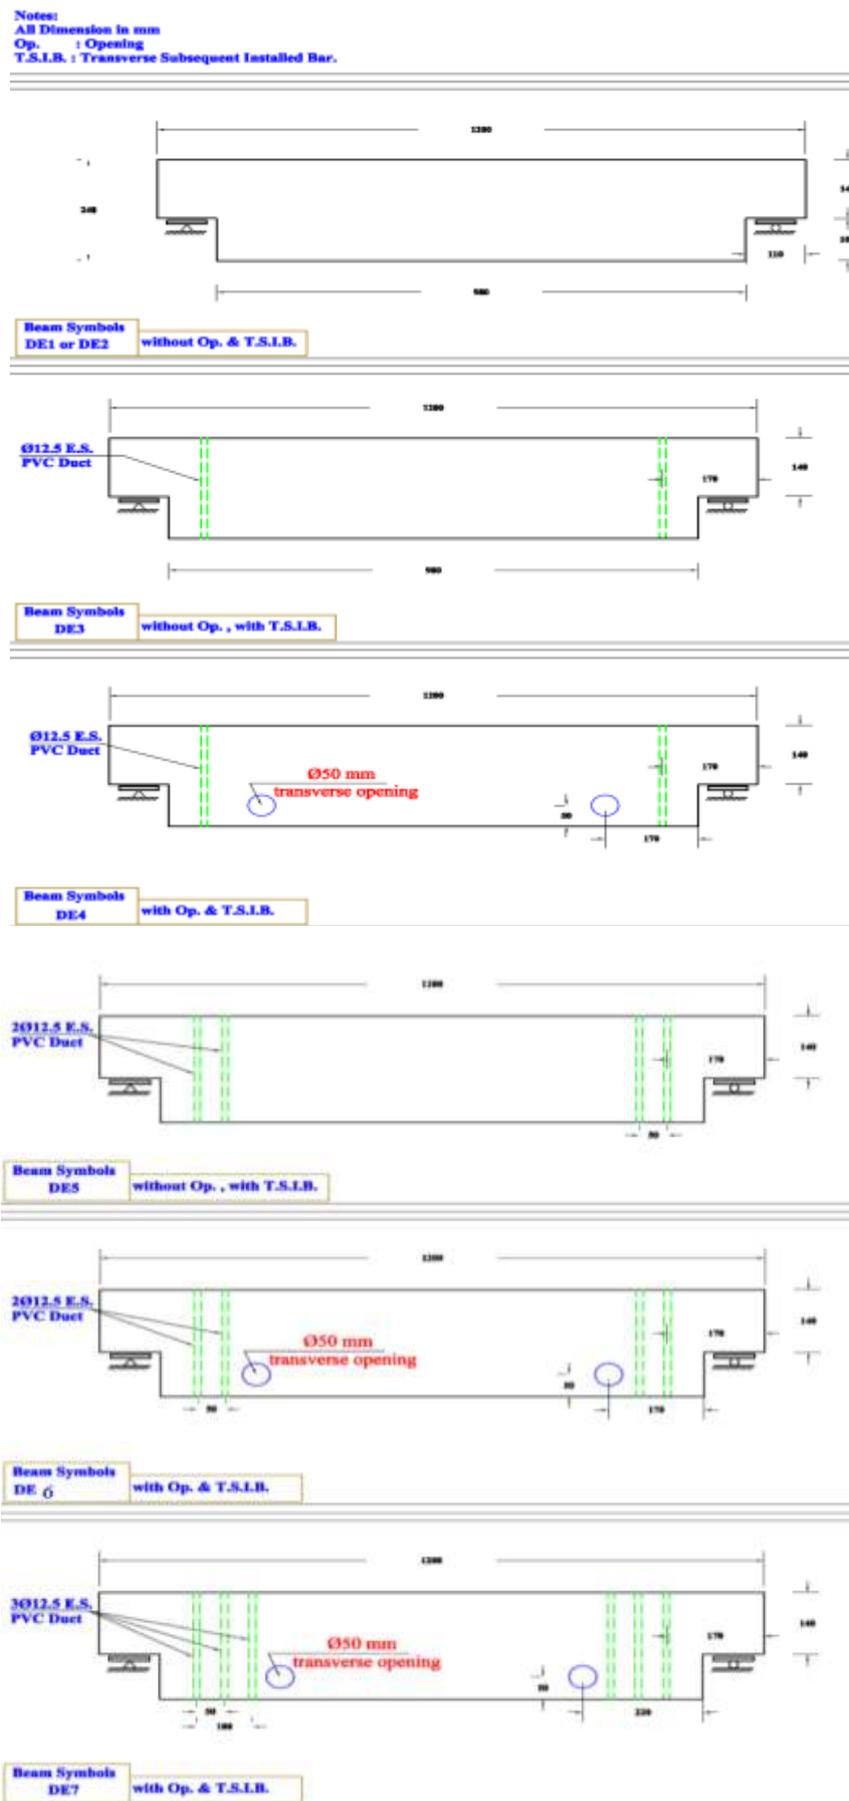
Location of OP. or T.S.I.B. in Dapped Ends R.C. Beam Specimen.
